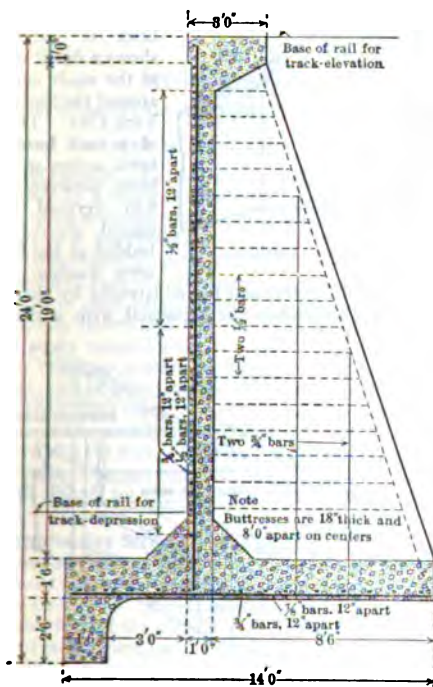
Reinforced-concrete Retaining-wall with Counterforts and Apron
